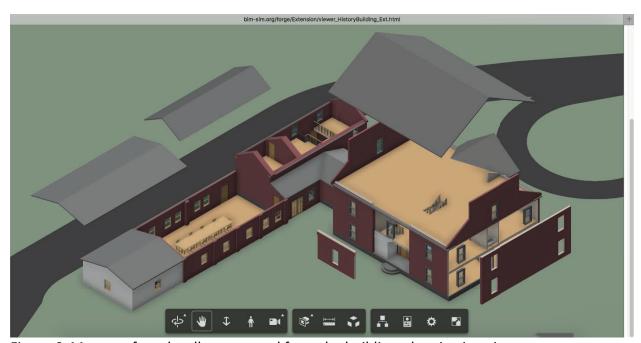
More roofs and walls are moved from the building, showing interior spaces.
